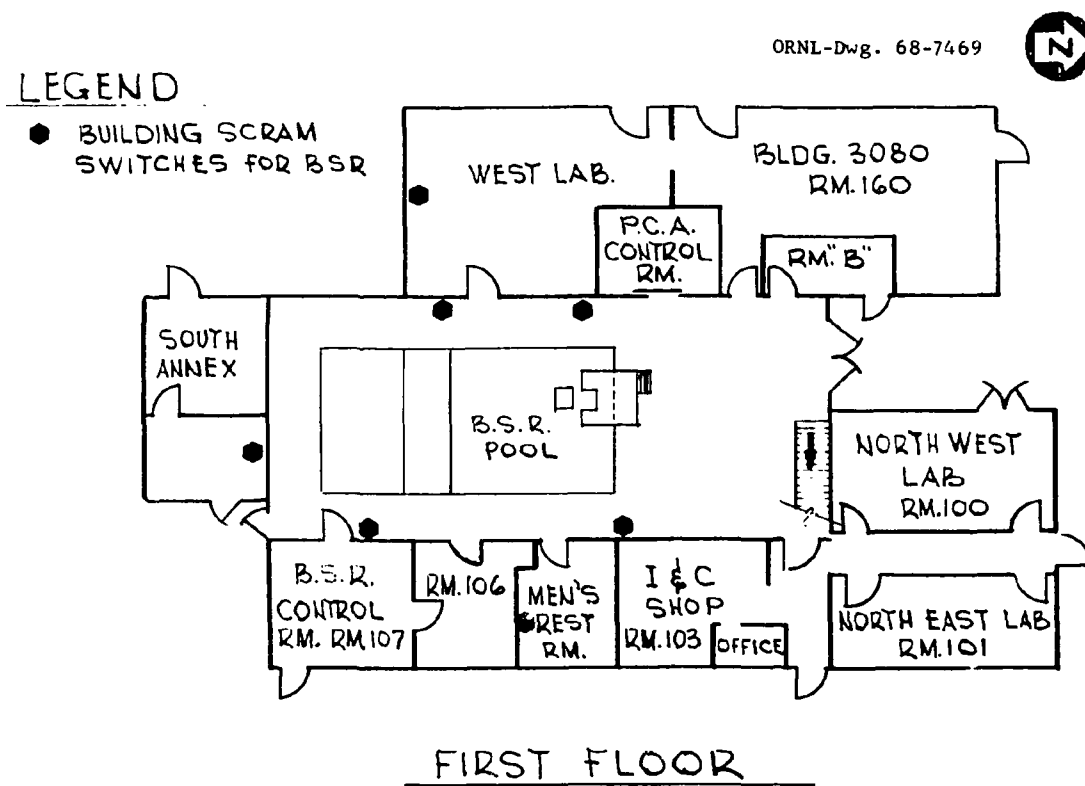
Location of seven remote scram switches on 1st floor of BSF, Building 3010.
